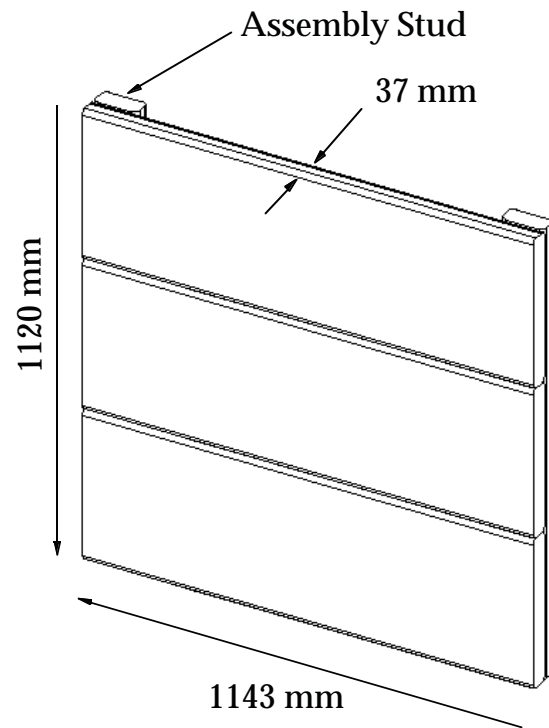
Specimen L15, a single layer built-up lumber specimen consisting of three “2x12” planks mounted on a “2x4” exterior frame. Both dry and wet specimens were tested.
